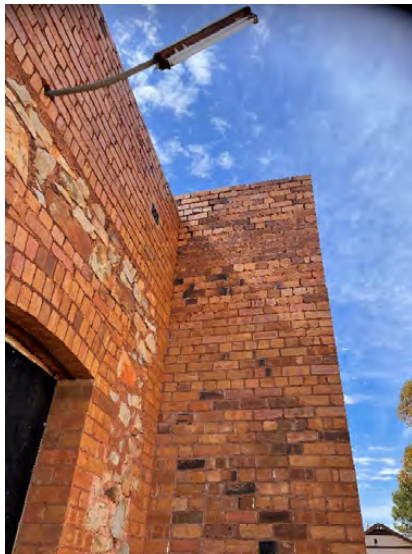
Cracking to external masonry, slight rotation of return wall
